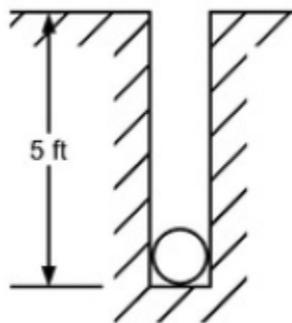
A horizontal loop geothermal pipe, typical section for one loop per pipe, *ASHRAE Application, Ch 34
